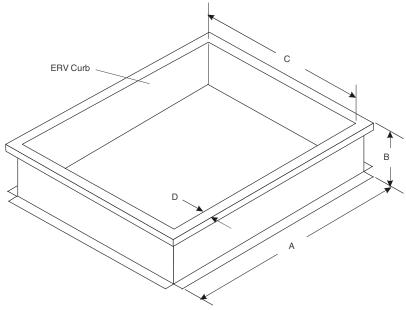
Roof Curb — 62M040 for Stand-Alone Applications
